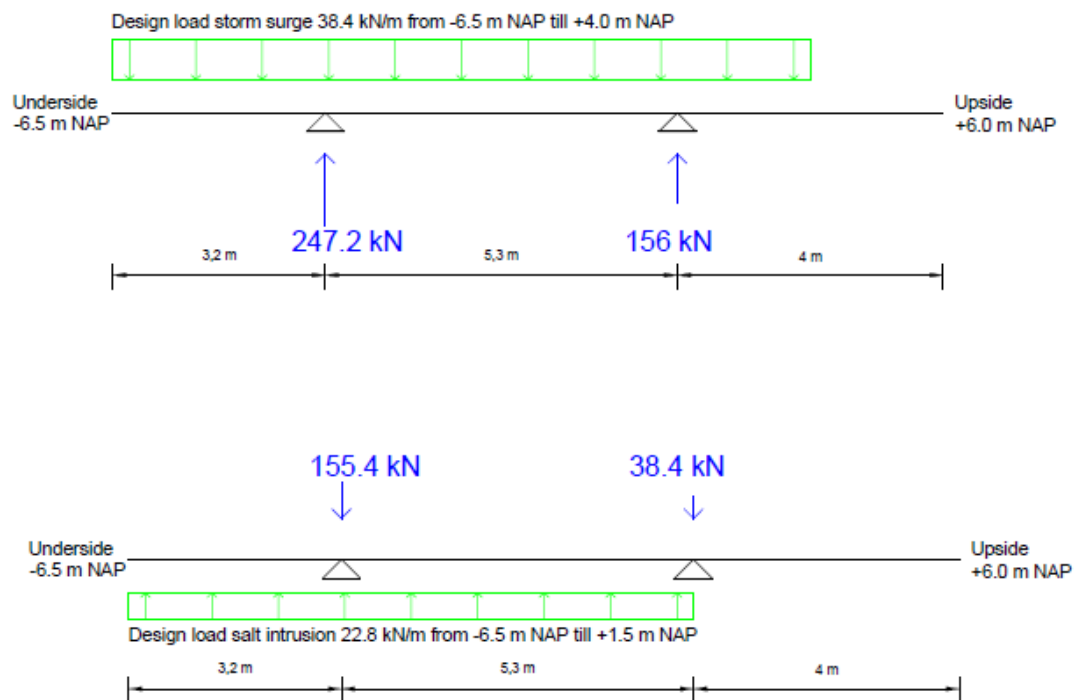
Schematization design loads storm surge and salt intrusion on one meter plate wall
